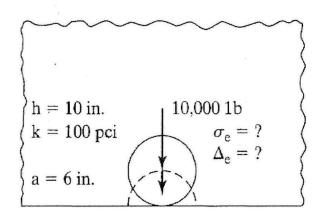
(d)(i): Concrete Slab Subjected to Slab Edge Loading
